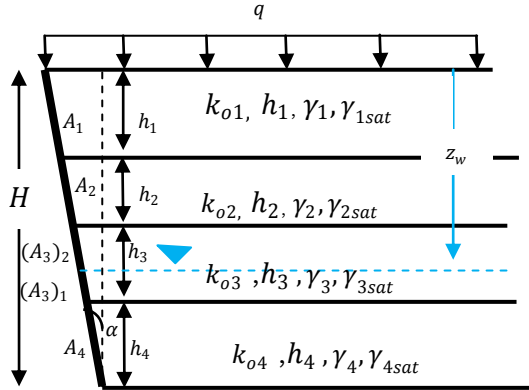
Multi layer soils with a retaining wall of inclined back face
